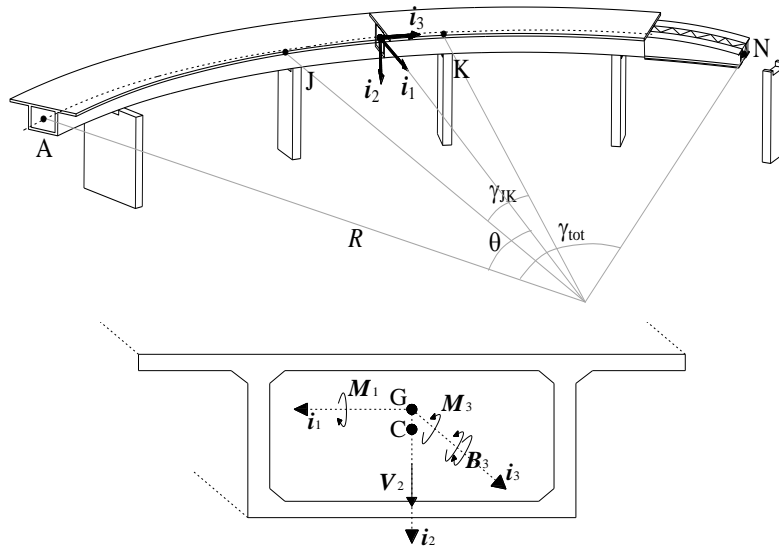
Curved continuous girder bridge, generic J-K span and box cross section with local axes.
